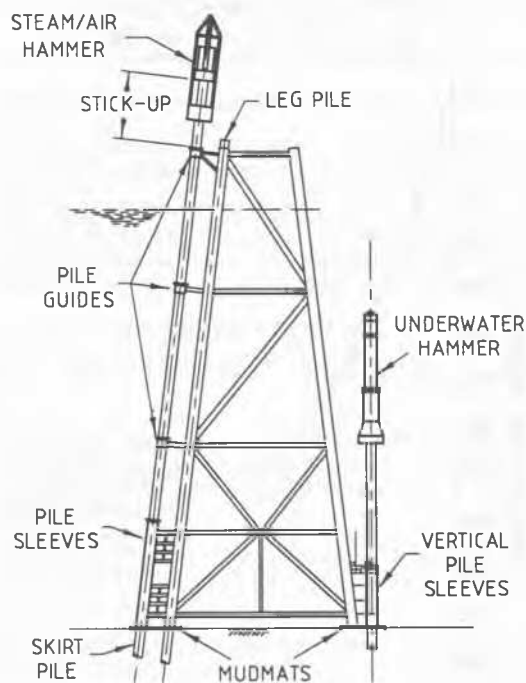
OFFSHORE PILED FOUNDATION CONCEPTS
